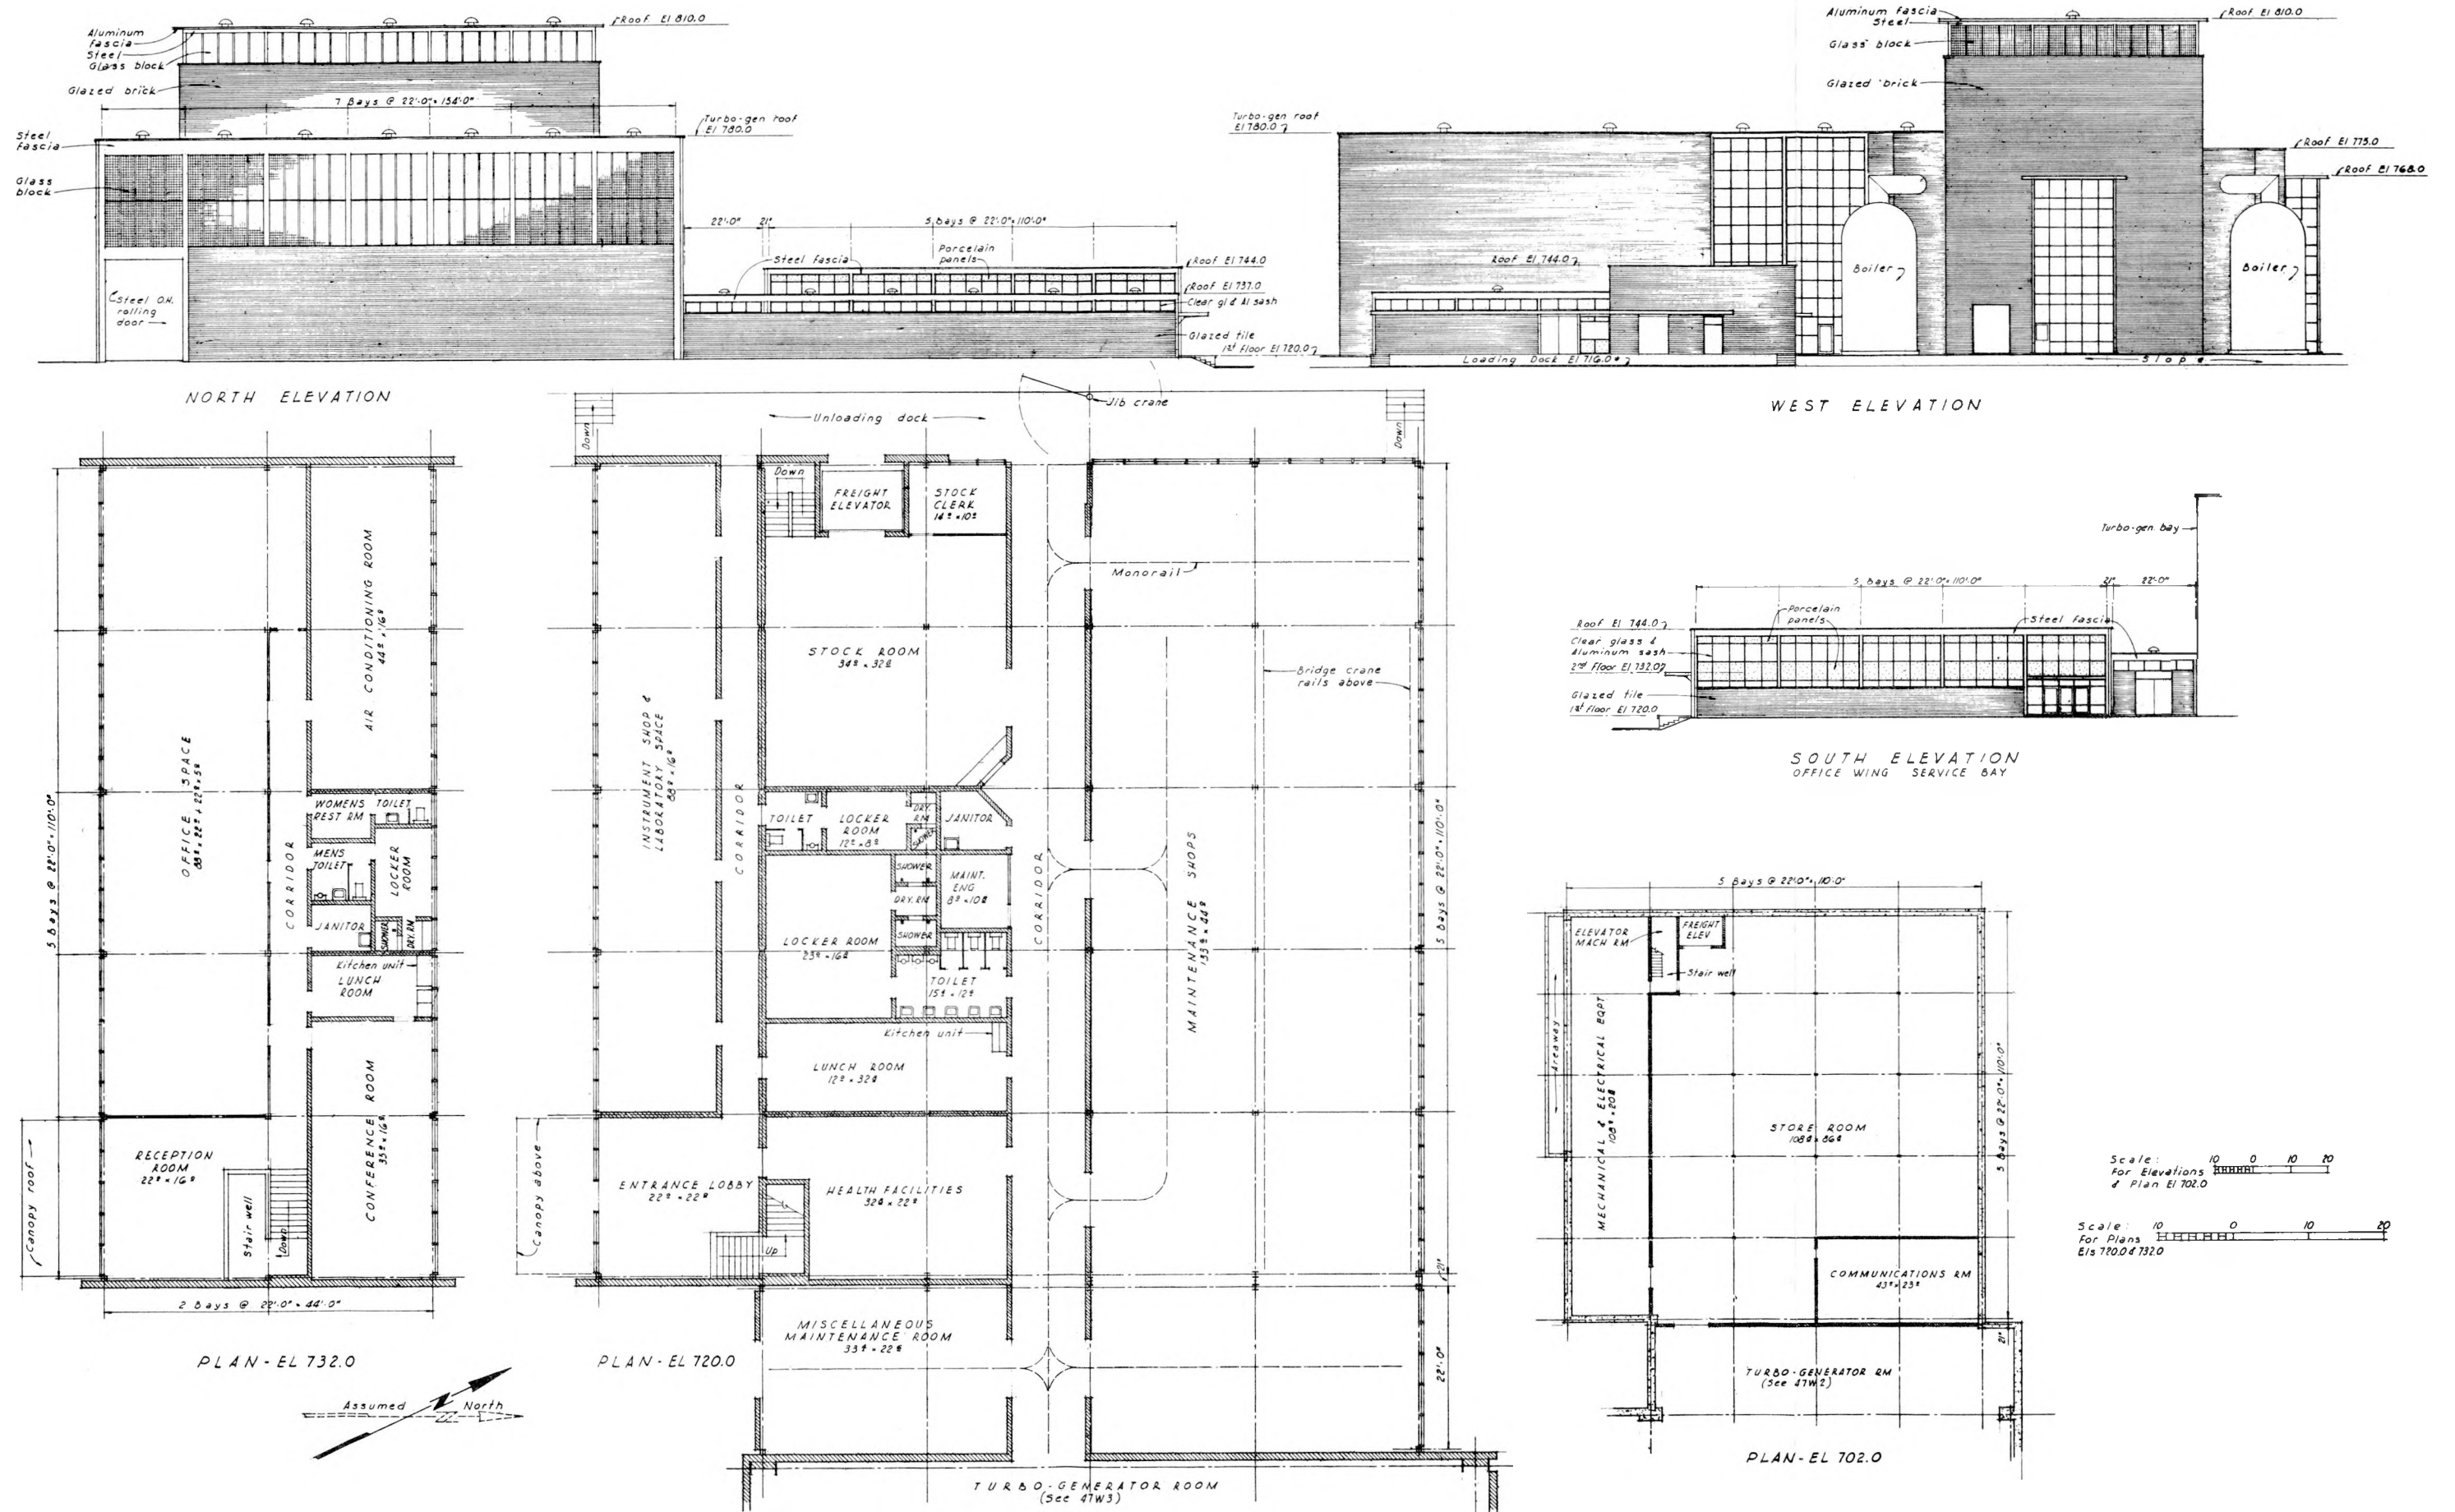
Architectural Plans and Elevations (ORNL - GCR-2) (Design Div., Tennessee Valley Authority).
